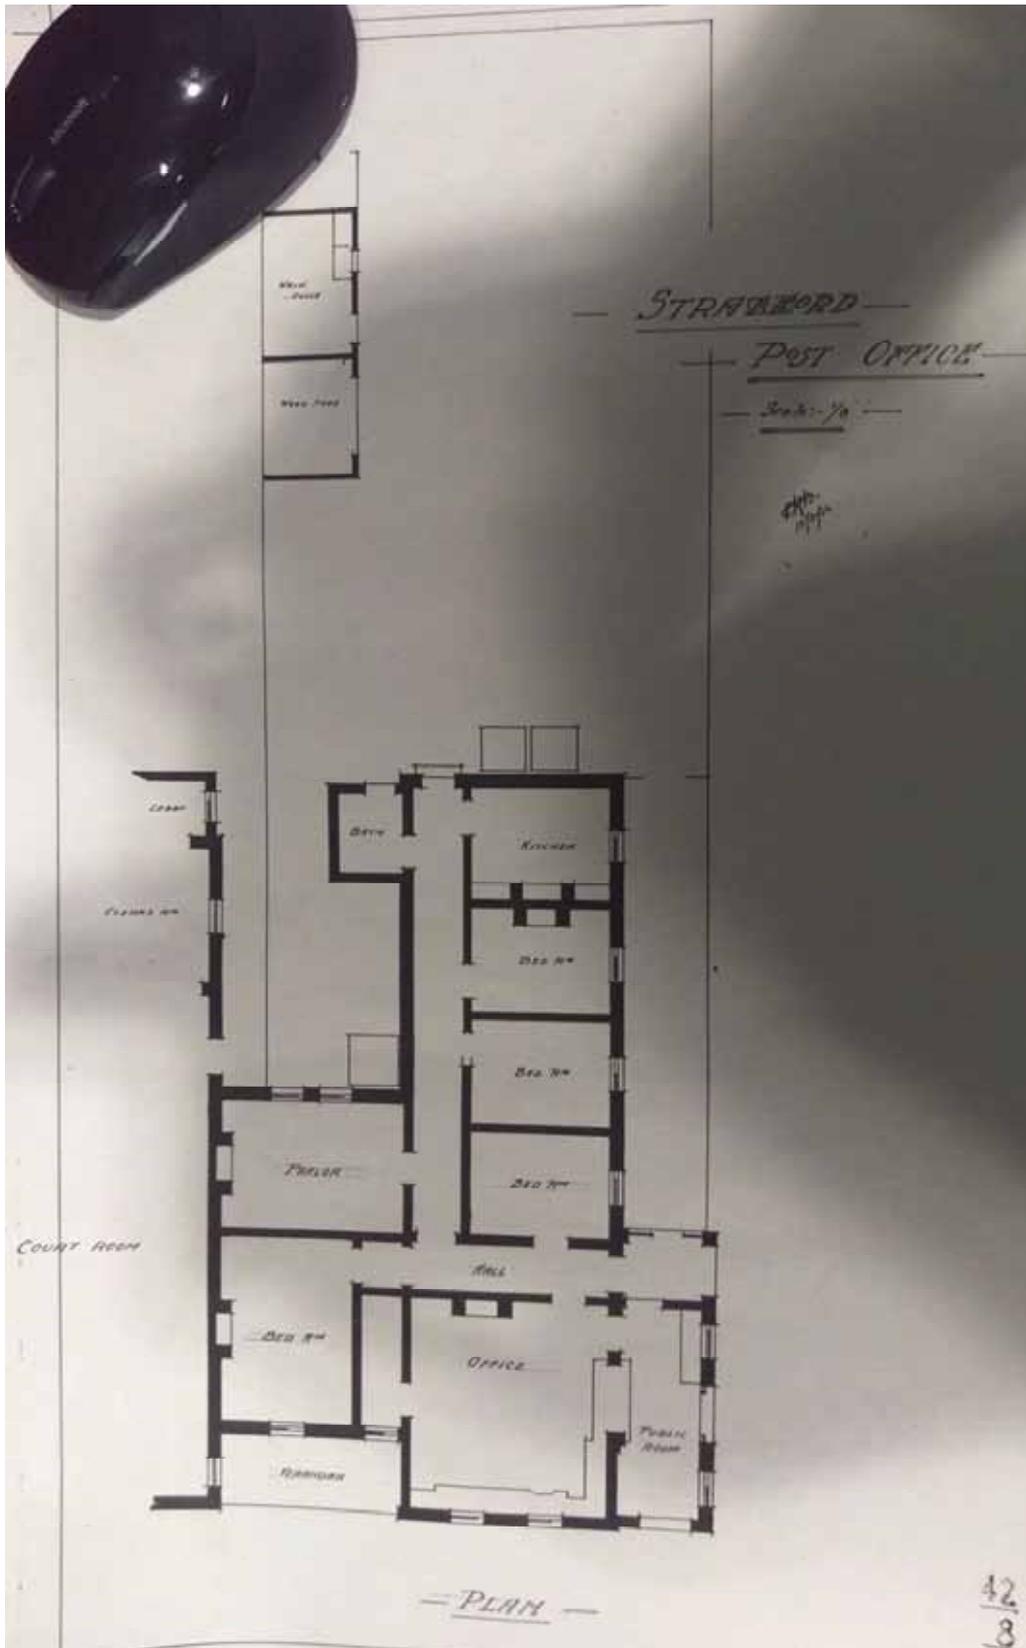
Plans dating to 1916 that showed the plan of the post office after the c1900 additions to the office and public room (Saleta 2016).
